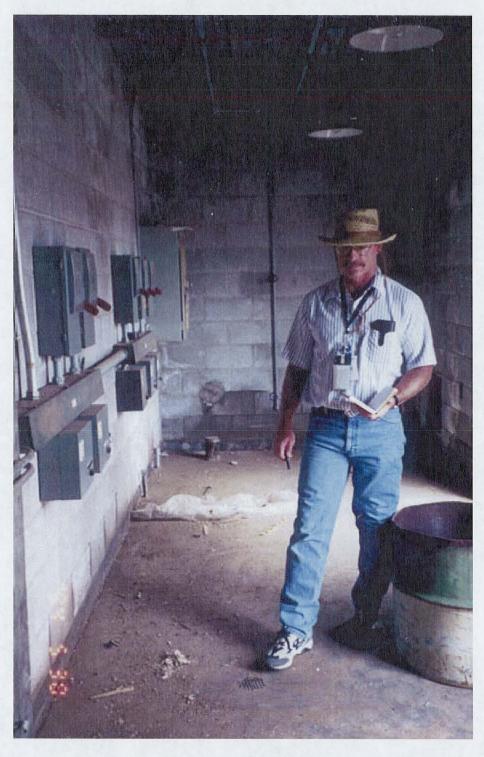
Floor drain inside the Building 6597 mechanical room that was connected to the Building 6597 drywell. View to the north. July 15, 1999
